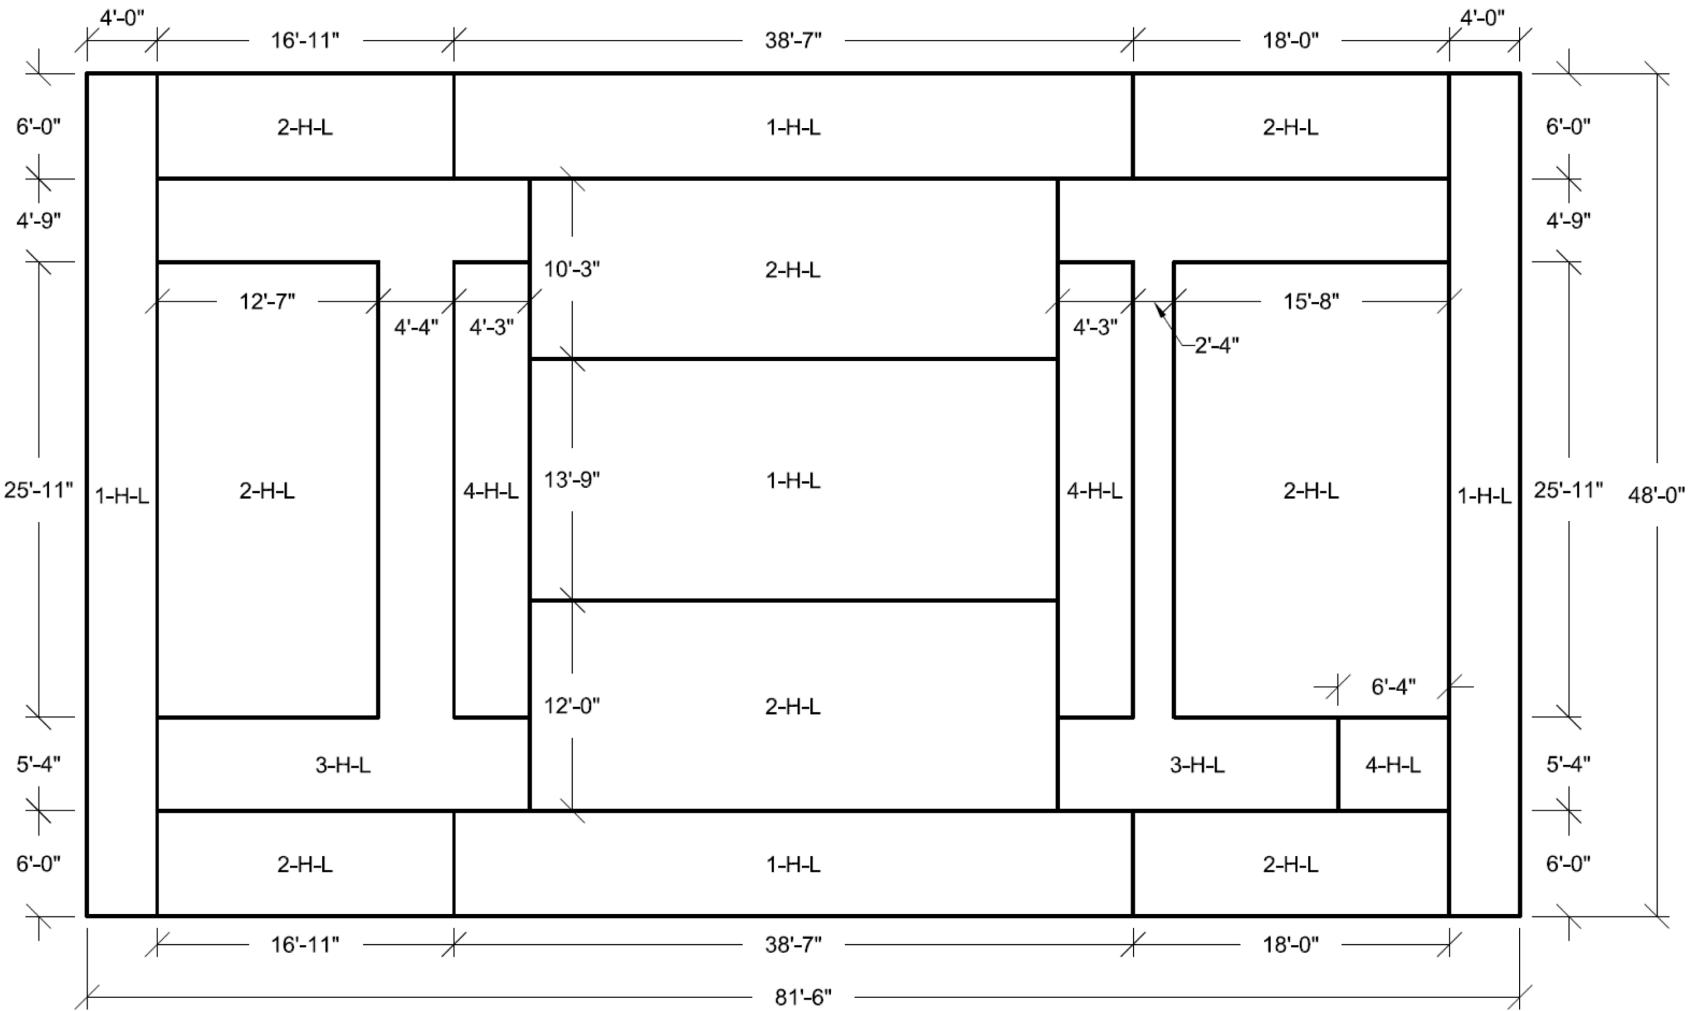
H.6-143 DGFOSV Slab 1 Looking Down Vertical Reinforcement Zones Near Side Face
